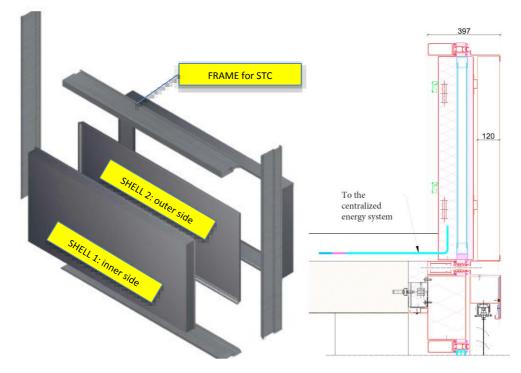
Façade Case Study_Aluminum profiles and sheets (left); vertical section (right)
